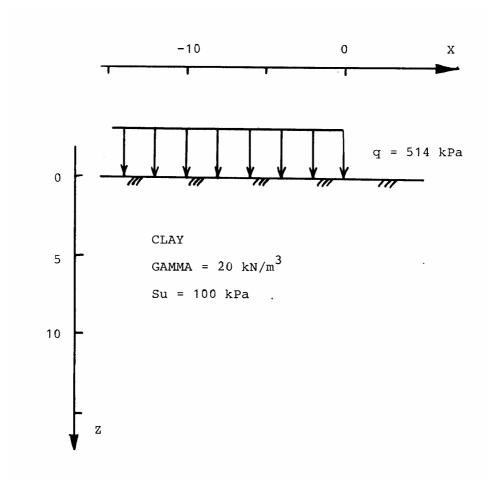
Test Example 1, Strip Loading on Clay
